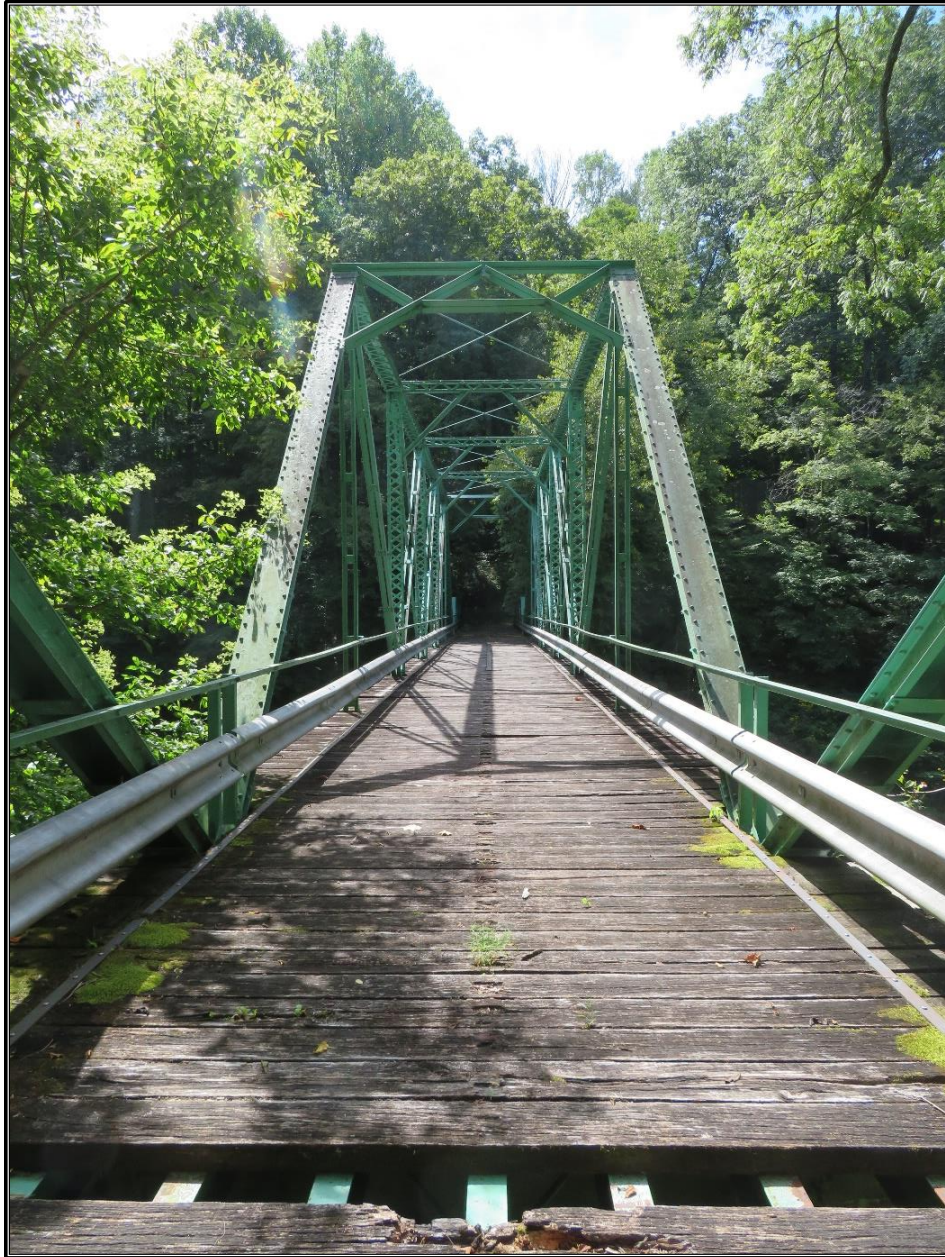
Deck of the bridge (P000-40-07088 B; NBI No. 060380), looking south.
